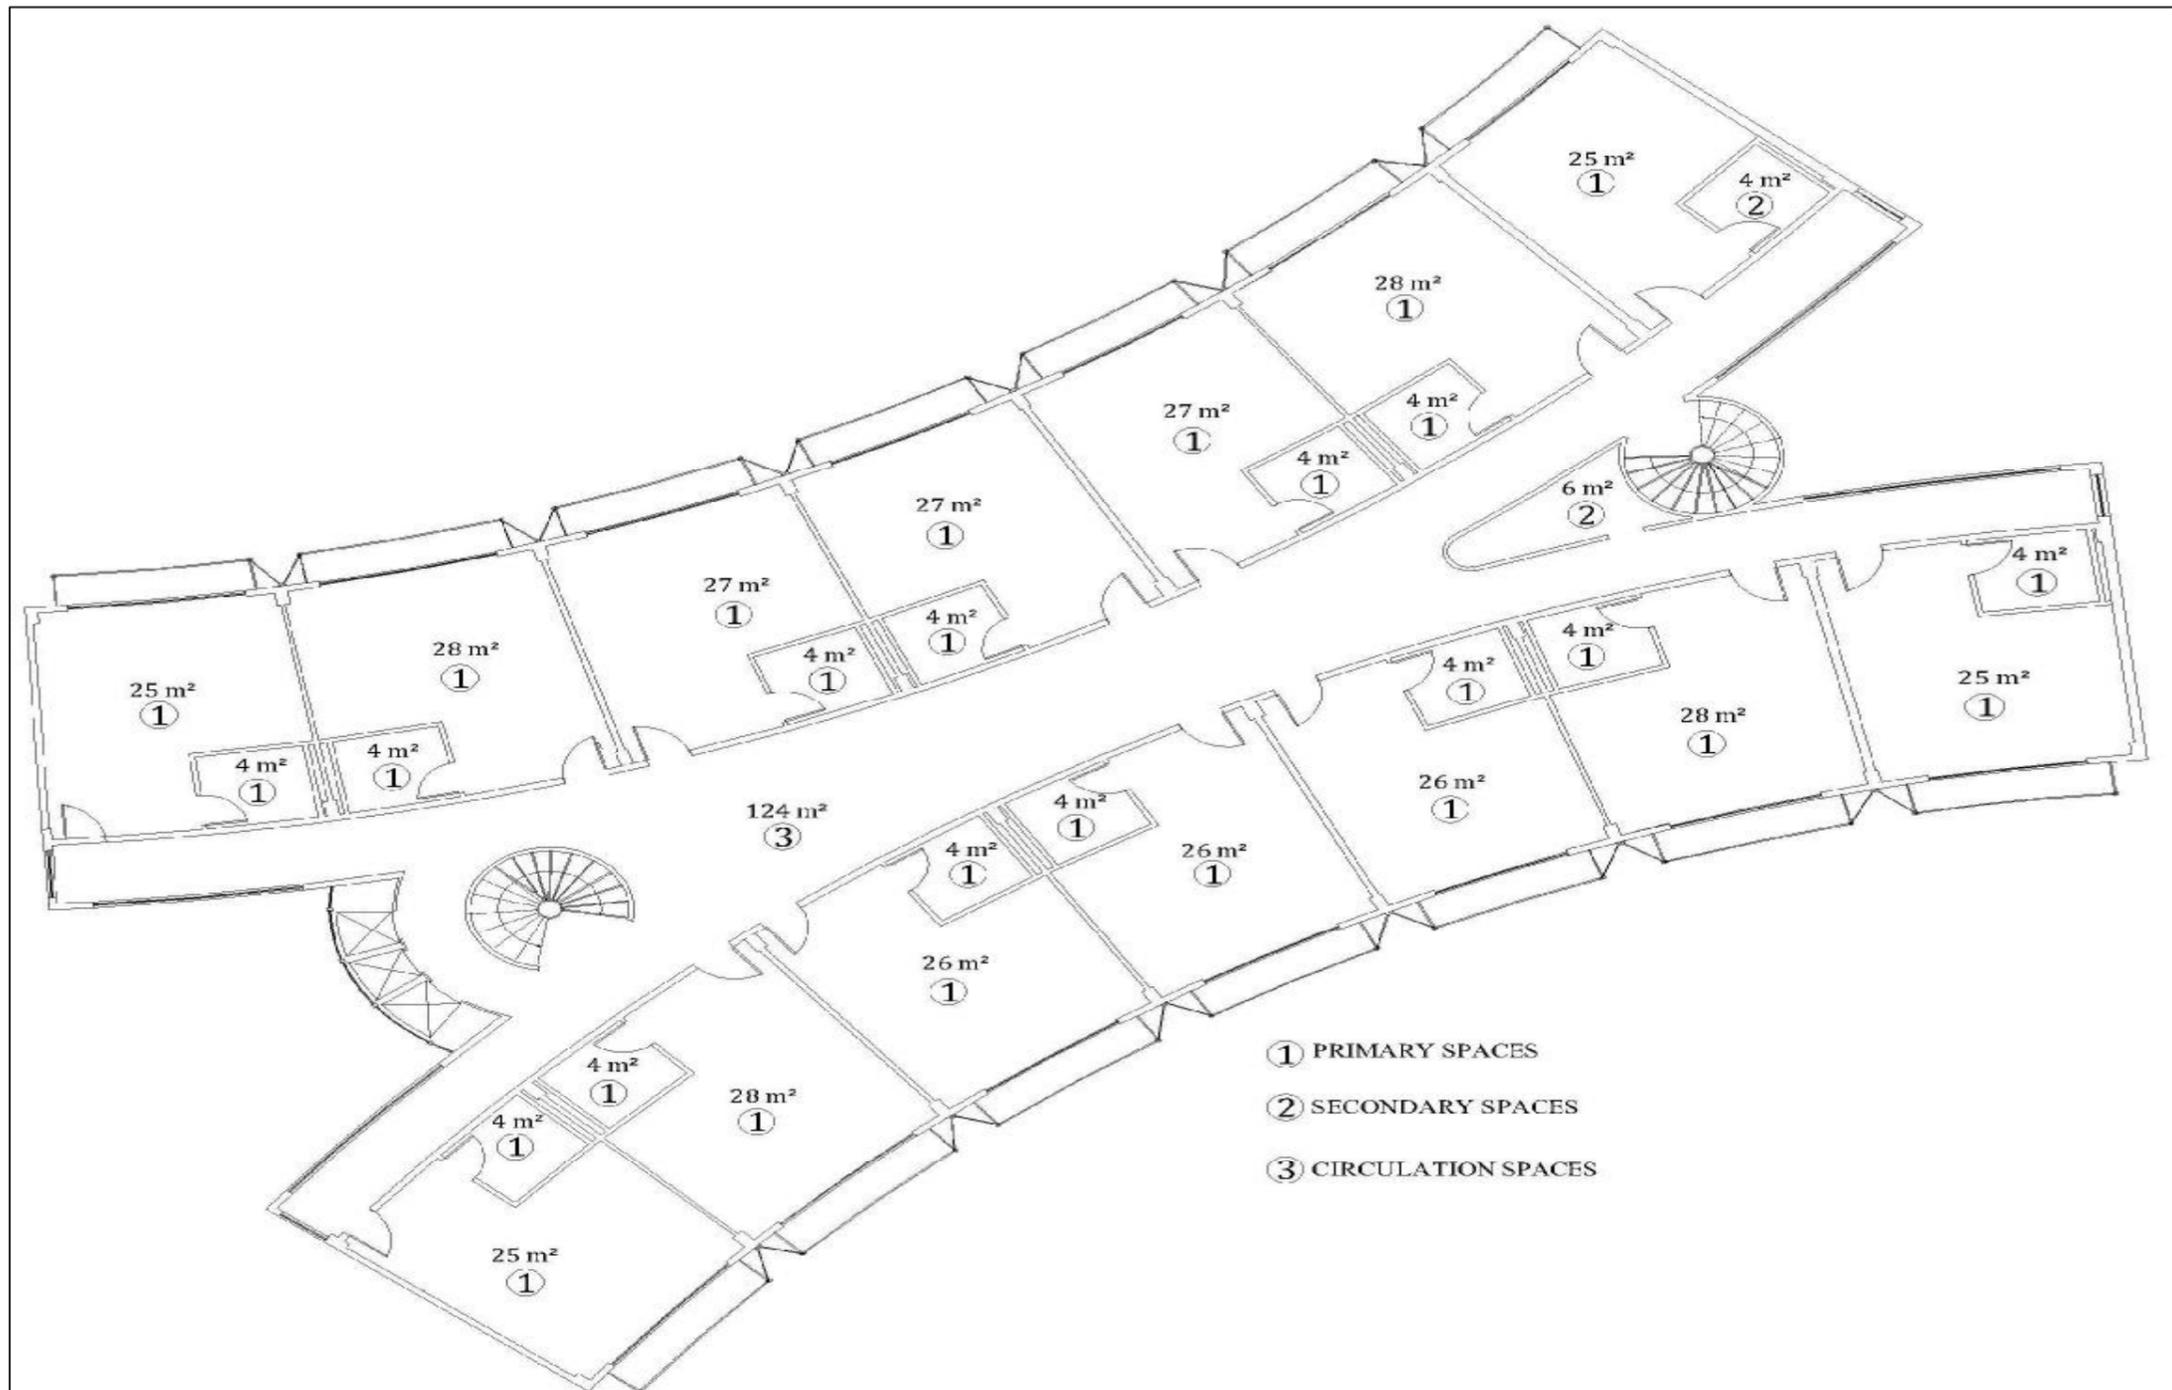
Floor plan of Sample 09 (S09) displaying, primary, secondary and circulation spaces.
